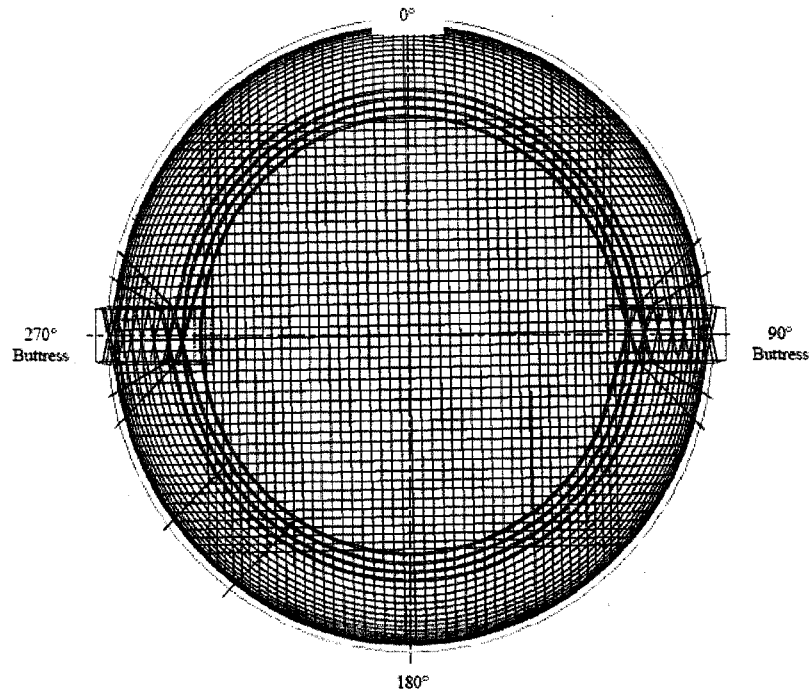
Pre-stressing tendon arrangement, dome (plan view from above).
